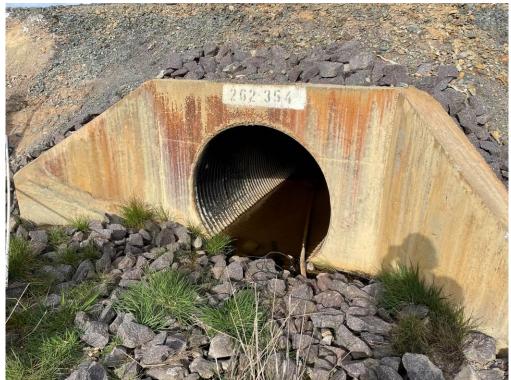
Sample location SW3 on unnamed drainage line adjacent to the rail corridor, facing south-east (12 September 2022)
